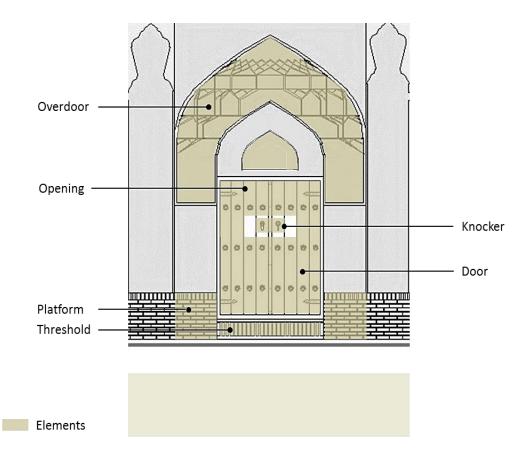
Entrance components of a traditional house – Elevation (Payamifar, 2020)
